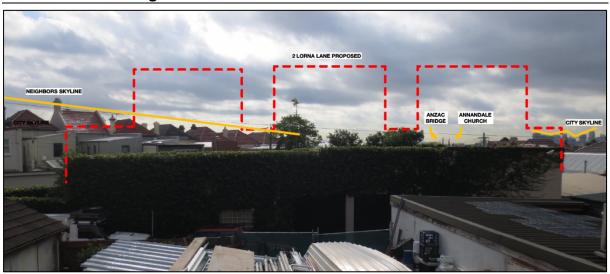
View from rear elevation bedroom window of No.94 Douglas Street, Stanmore
